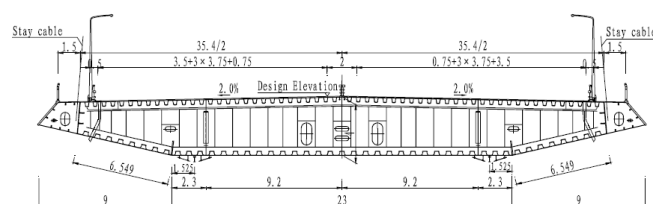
General Structure of Steel Box Girder Cross Section (Unit: m)
